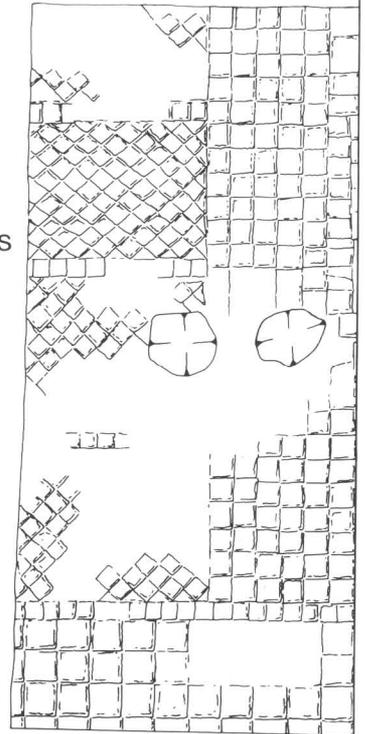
plan of Chapel floor, to east of ante-chapel, showing numbered floor panels.
